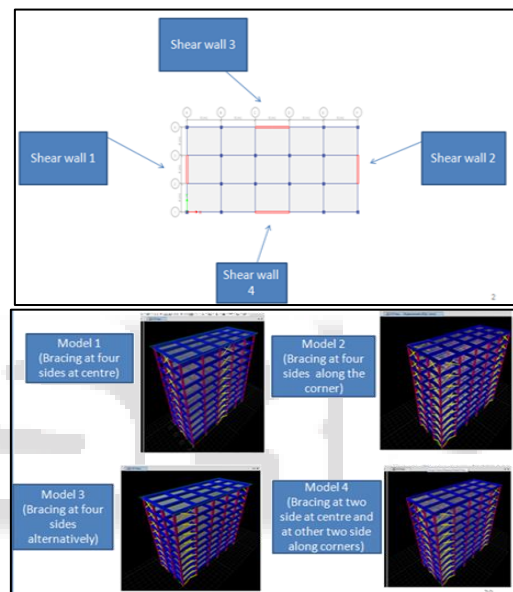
Building Plan Having Shear Walls & Bracing System The above Building model is analysed by Response spectrum analysis and Shear deformation of Building with shear wall having different Aspect ratio and Building having Bracing system (Fig 1) under four different configuration is obtained
